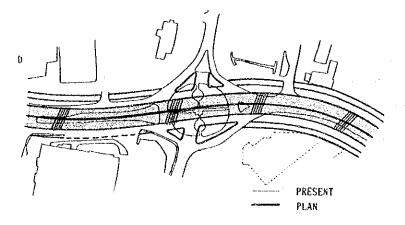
ALTERNATIVE PLANS OF MONUMENTO A LA MADRE INTERSECTION
